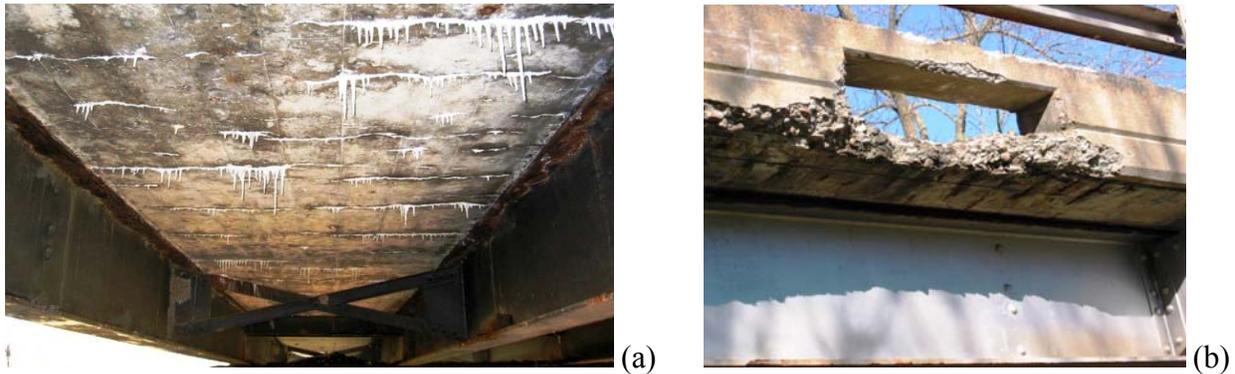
Old Bridge 14802301, Greene County, MO: degradation of concrete deck and steel girders (a), and of safety appurtenance (b).
